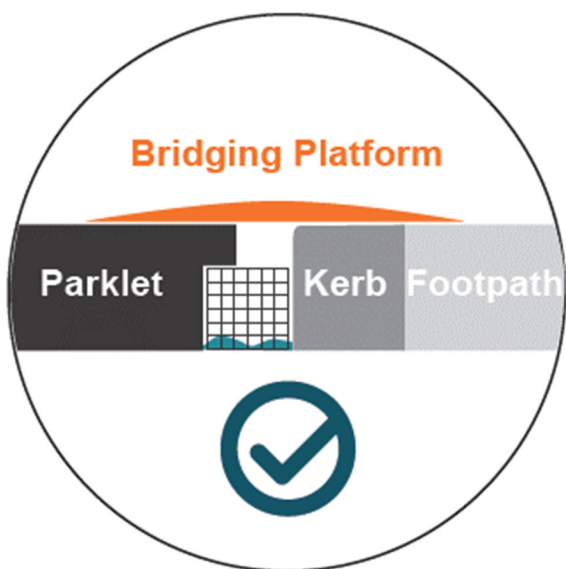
Bridging platform covers a gap between the platform and the kerb upstand.
